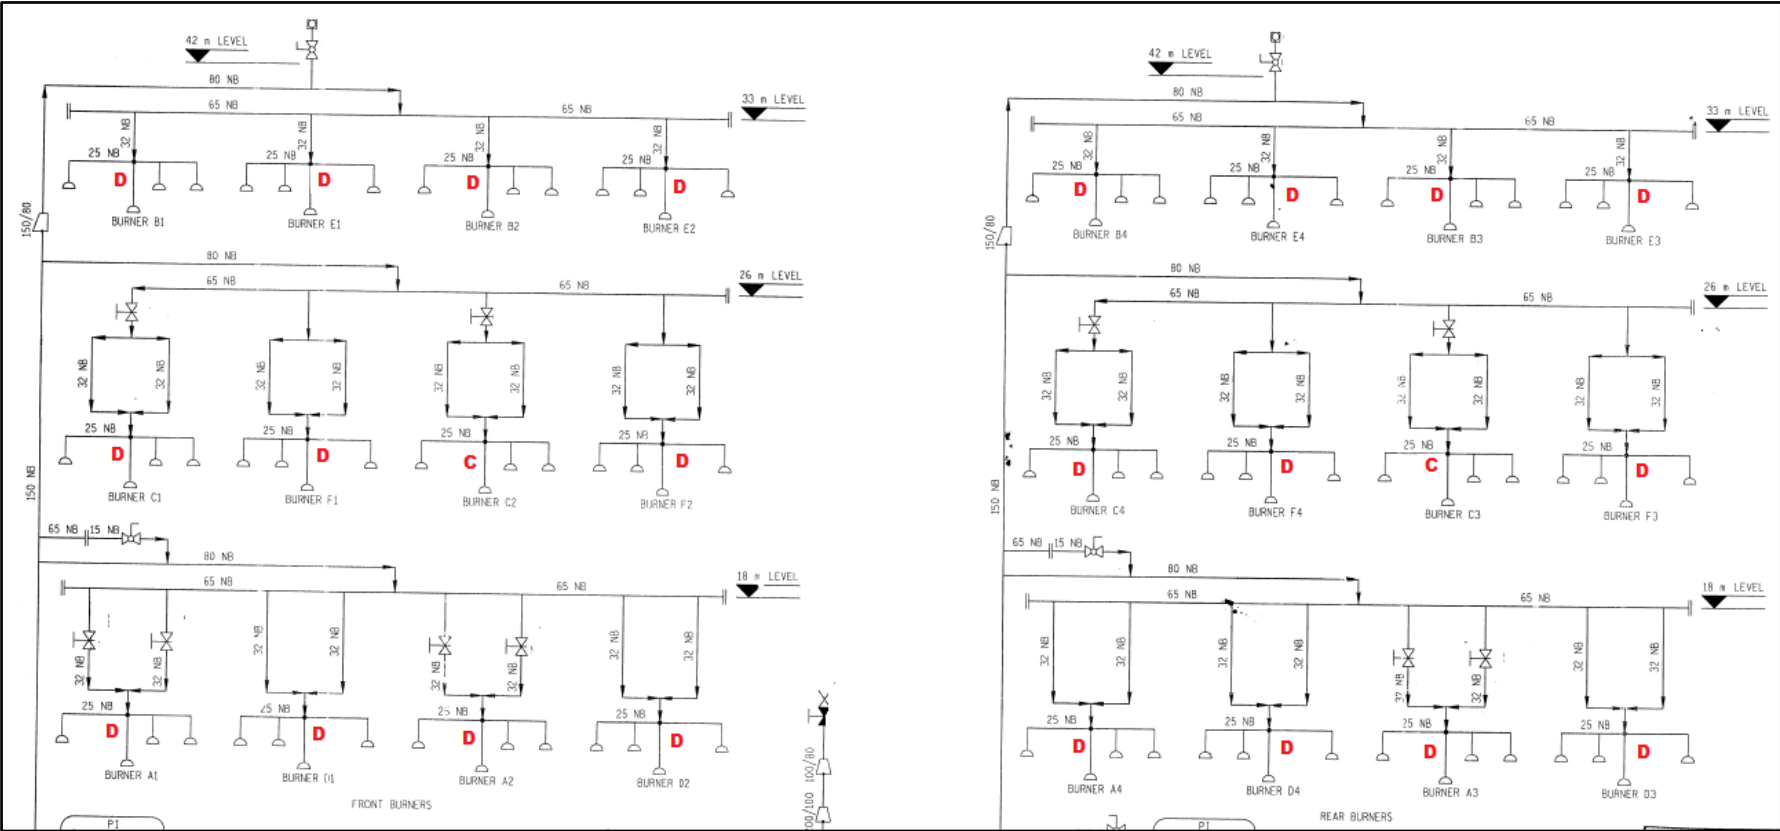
Unit 3 Boiler Burners MJC Locations [53]
